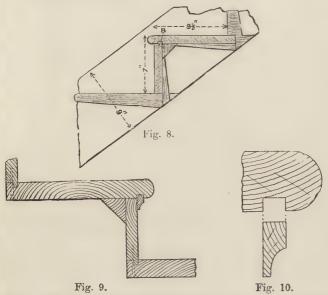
Section showing Riser housed into Tread. Fig. 9.—Section showing Tread and Riser. Fig. 10.—Nosing and Scotia of Tread.
